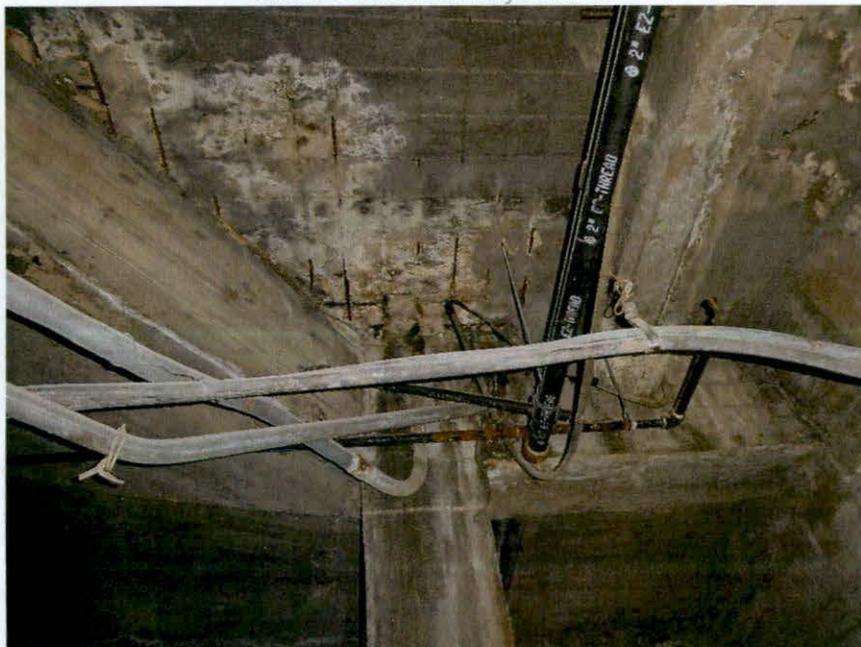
Photo EE: View of cracked concrete and efflorescence stains at basement level under sidewalk.
